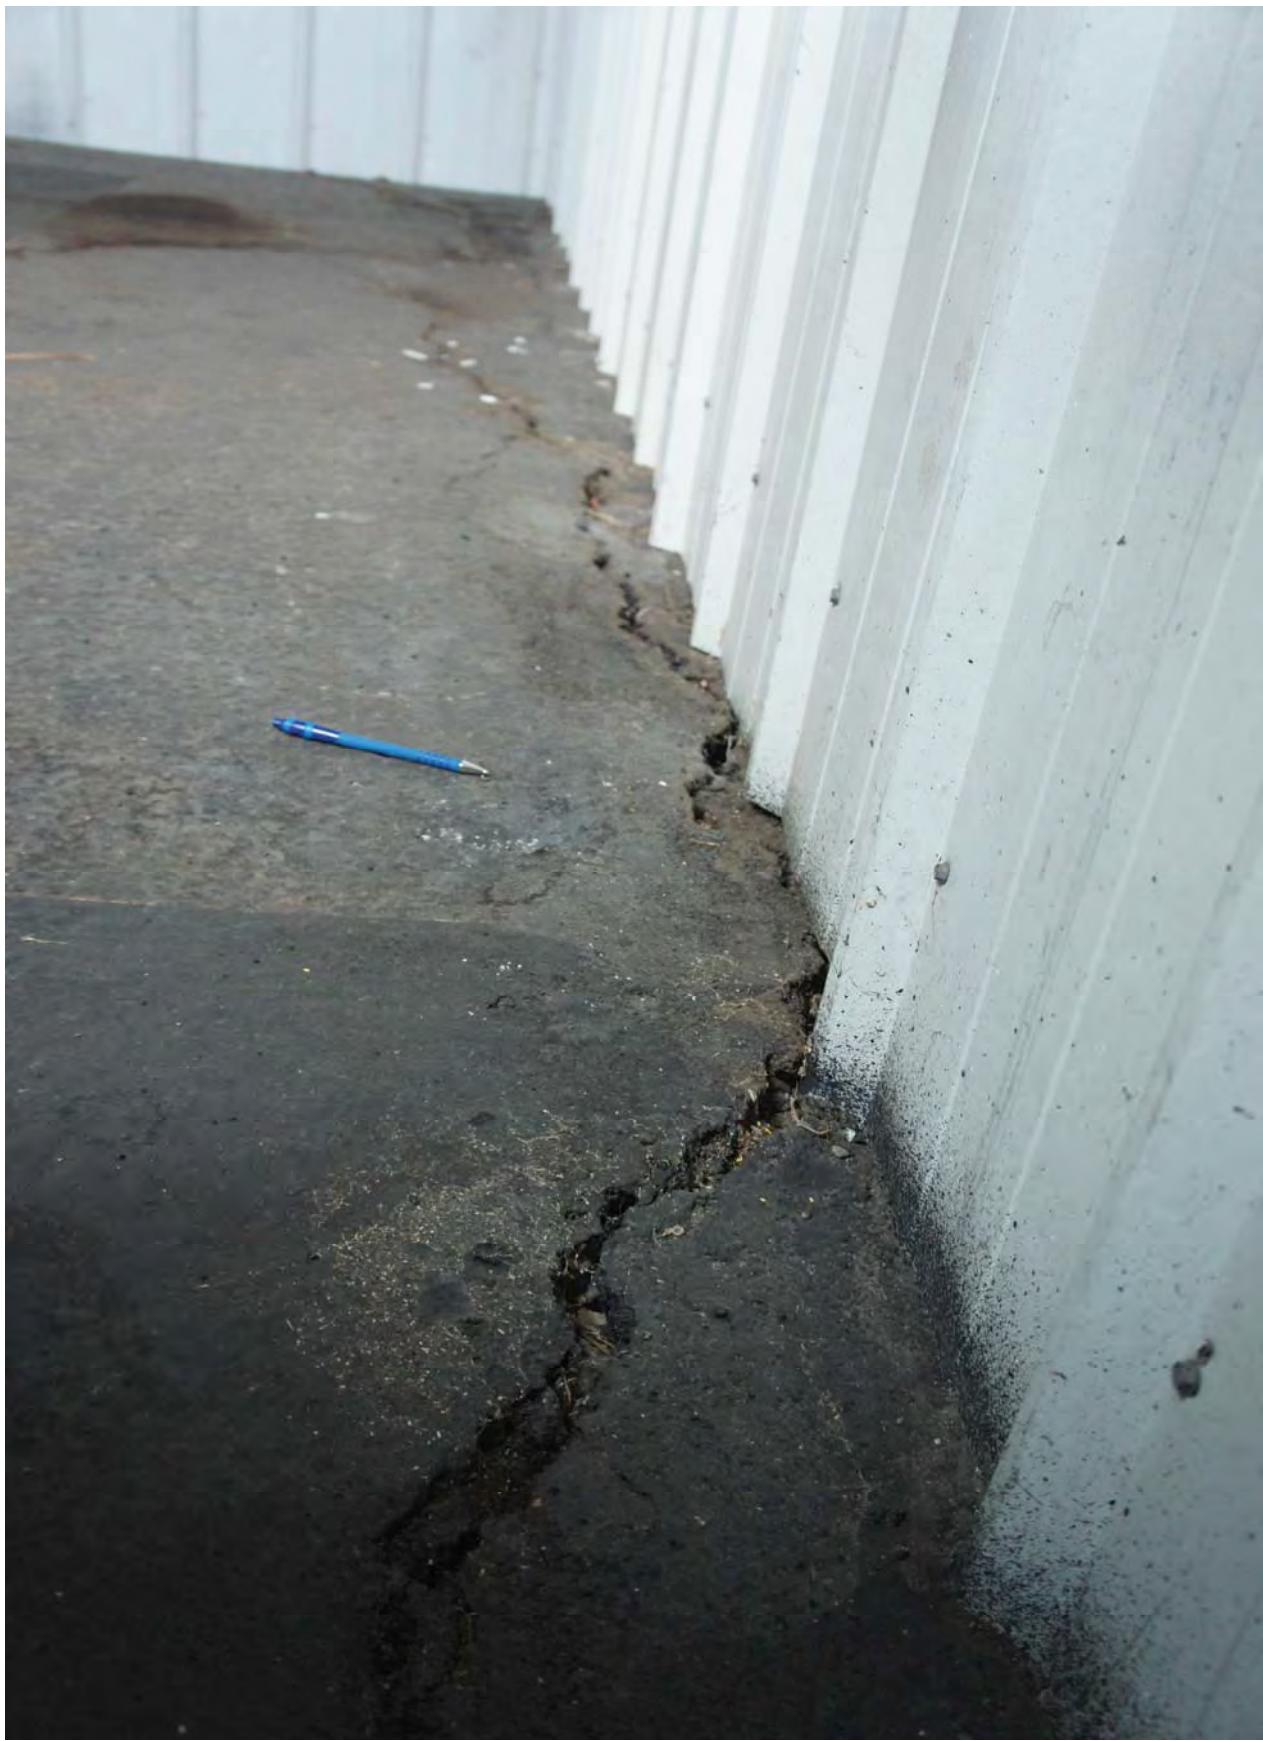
Cracks in asphalt concrete floor inside Hangar K (Building 17). AC is at or above the metal siding level.
